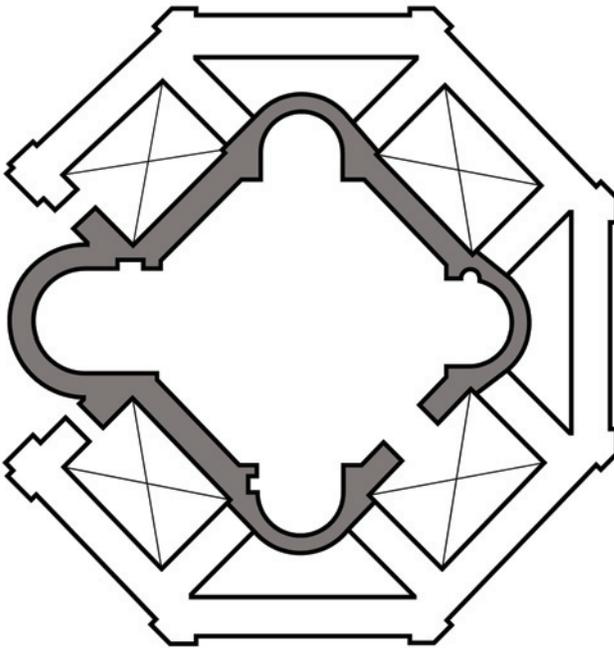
Arian Baptistery plan, Ravenna, late fifth century. Drawing, based on plan in Deichmann, Ravenna, 2.a., plan 15.
